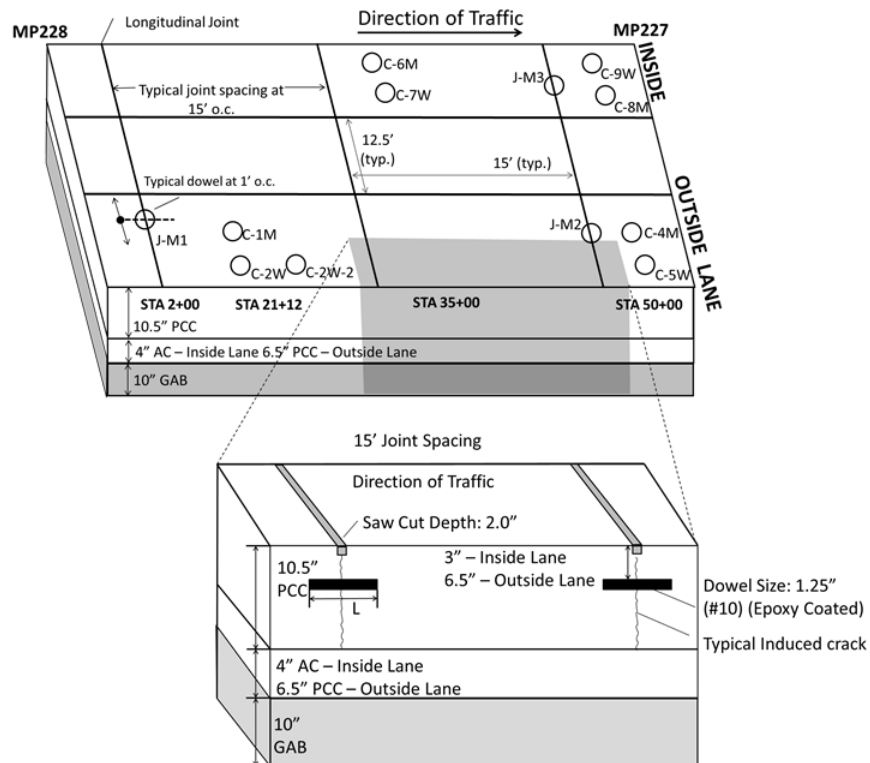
3D View of Coring Locations and JPCP details for I-75 (poor condition).
